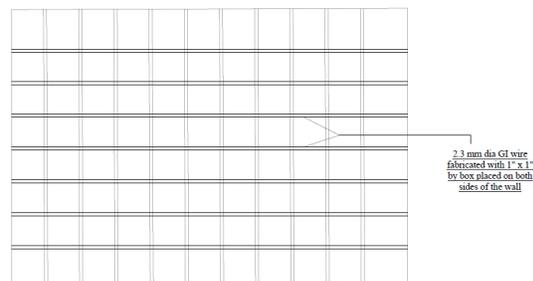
Detailing of Jacketing 2.3mm @ 25 mm bothways
